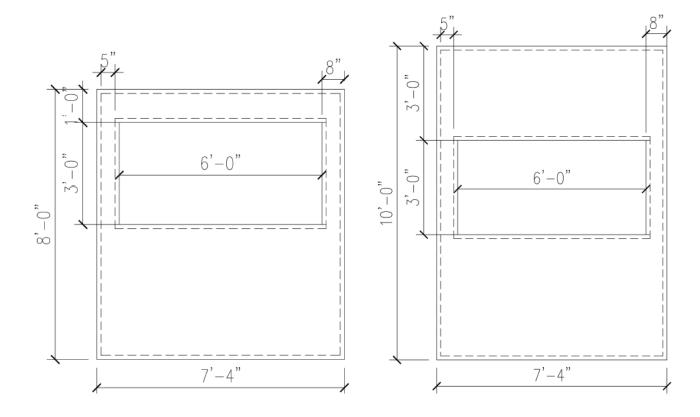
WALL PANEL OPENING WITH 1-FOOT HEADER
